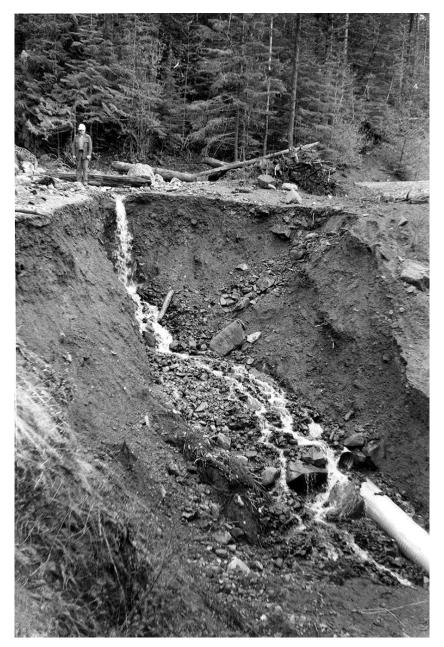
Culvert failure on Forest Service Road 5403 following 1977 flood events
